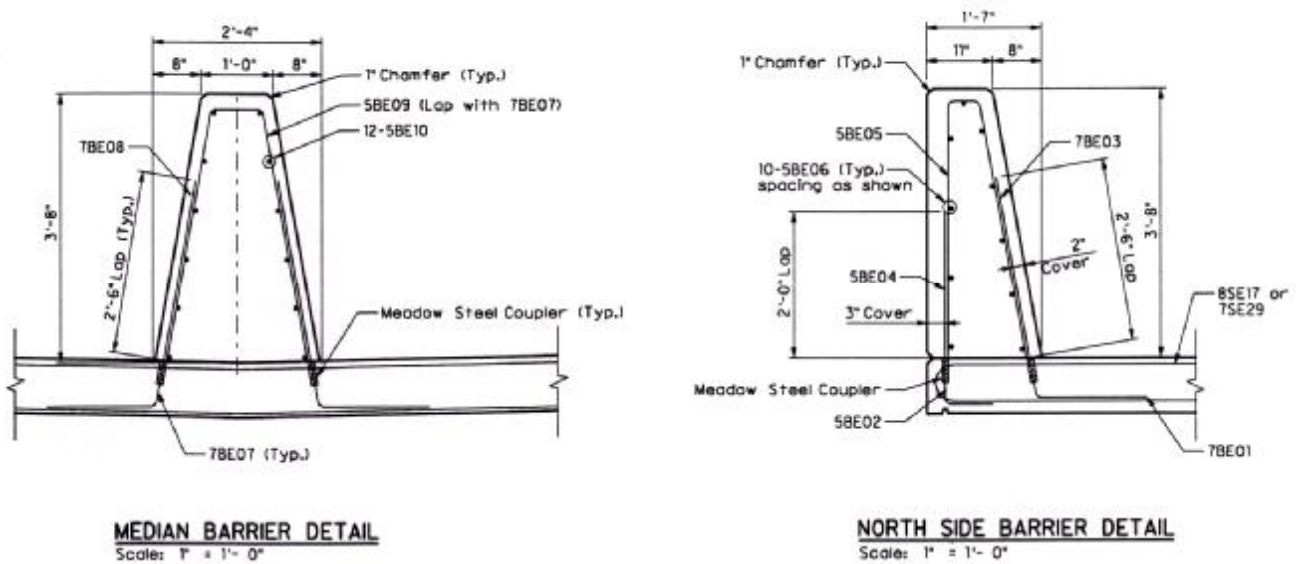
Details of the connection between the CIP barriers and the precast panel
